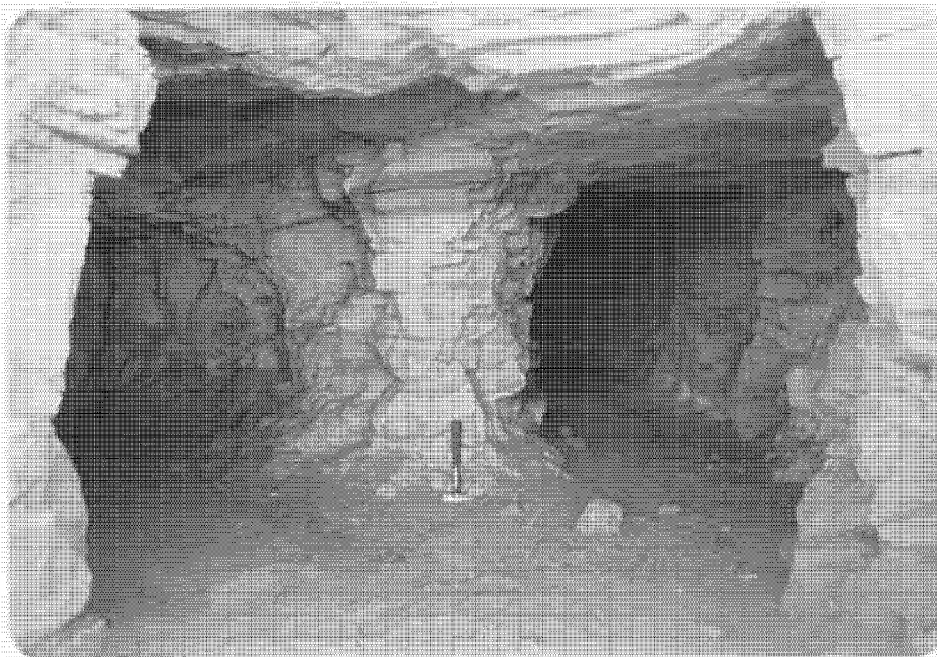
Photo B - Looking east inside adit. Note drift on left side of photo. Hammer in foreground for scale.
